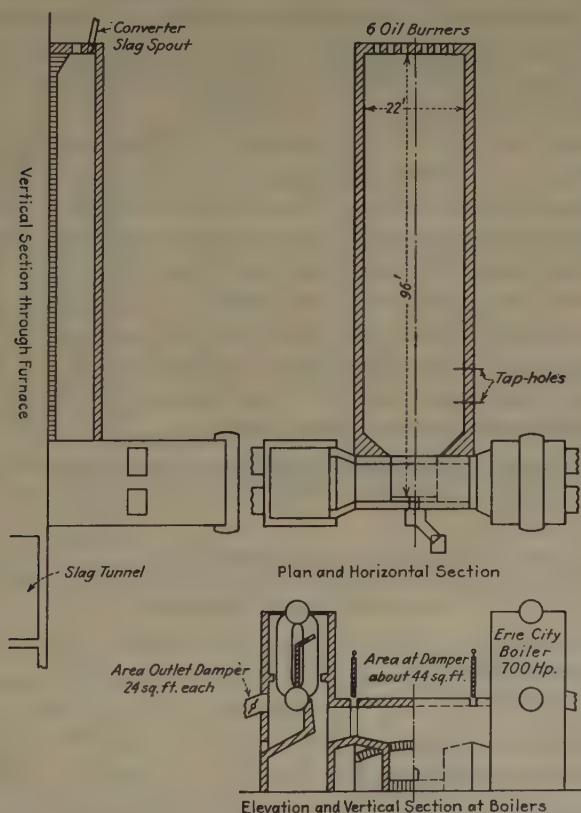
ARRANGEMENT OF REVERBERATORY FURNACE AND WASTE-HEAT BOILERS, MAGMA COPPER CO.
